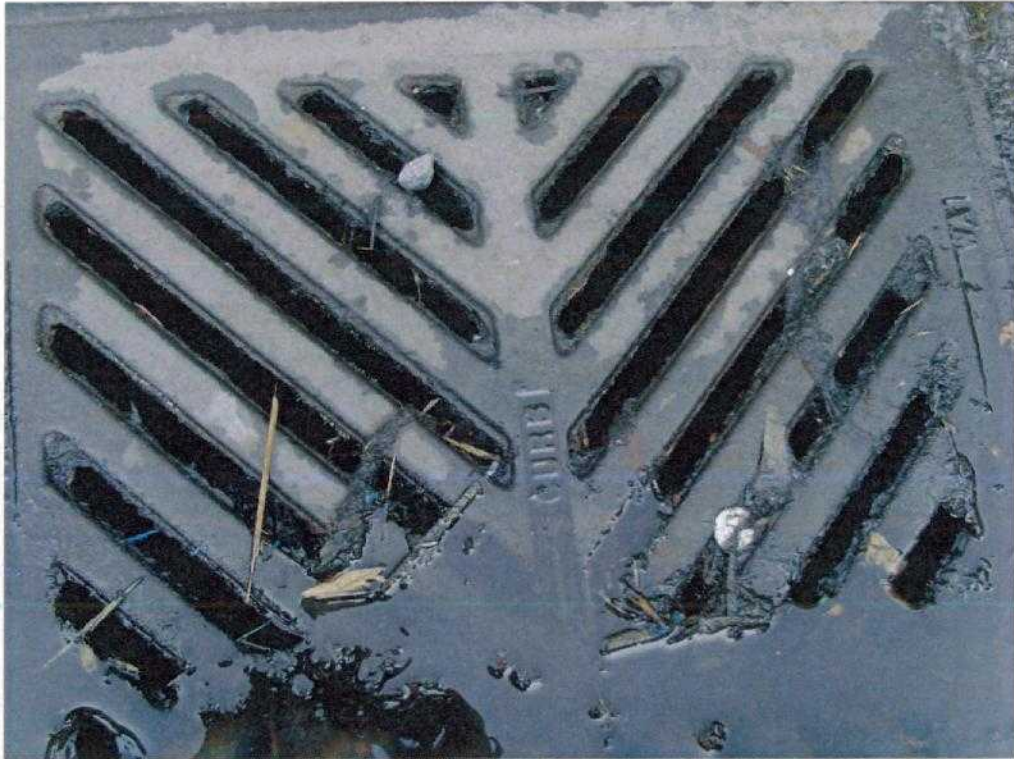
(SI850483): Storm drain #04 to the north of the plywood storage building. Note that no stormwater filter inserts were installed in this drain on 4/29/16.
